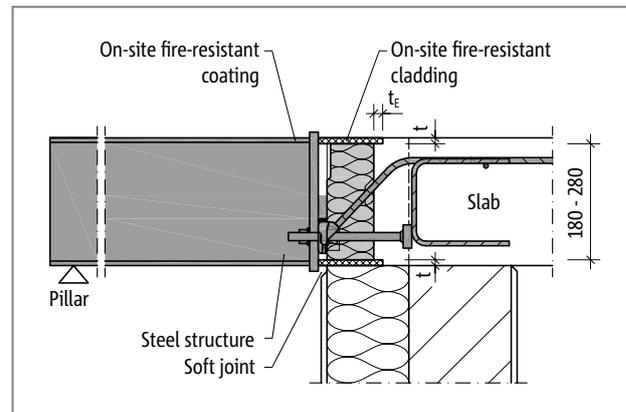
Schöck Isokorb® T type SQ: on site fire-resistant cladding of the connection when using steel structures with fire-resistant coating; cross-section
